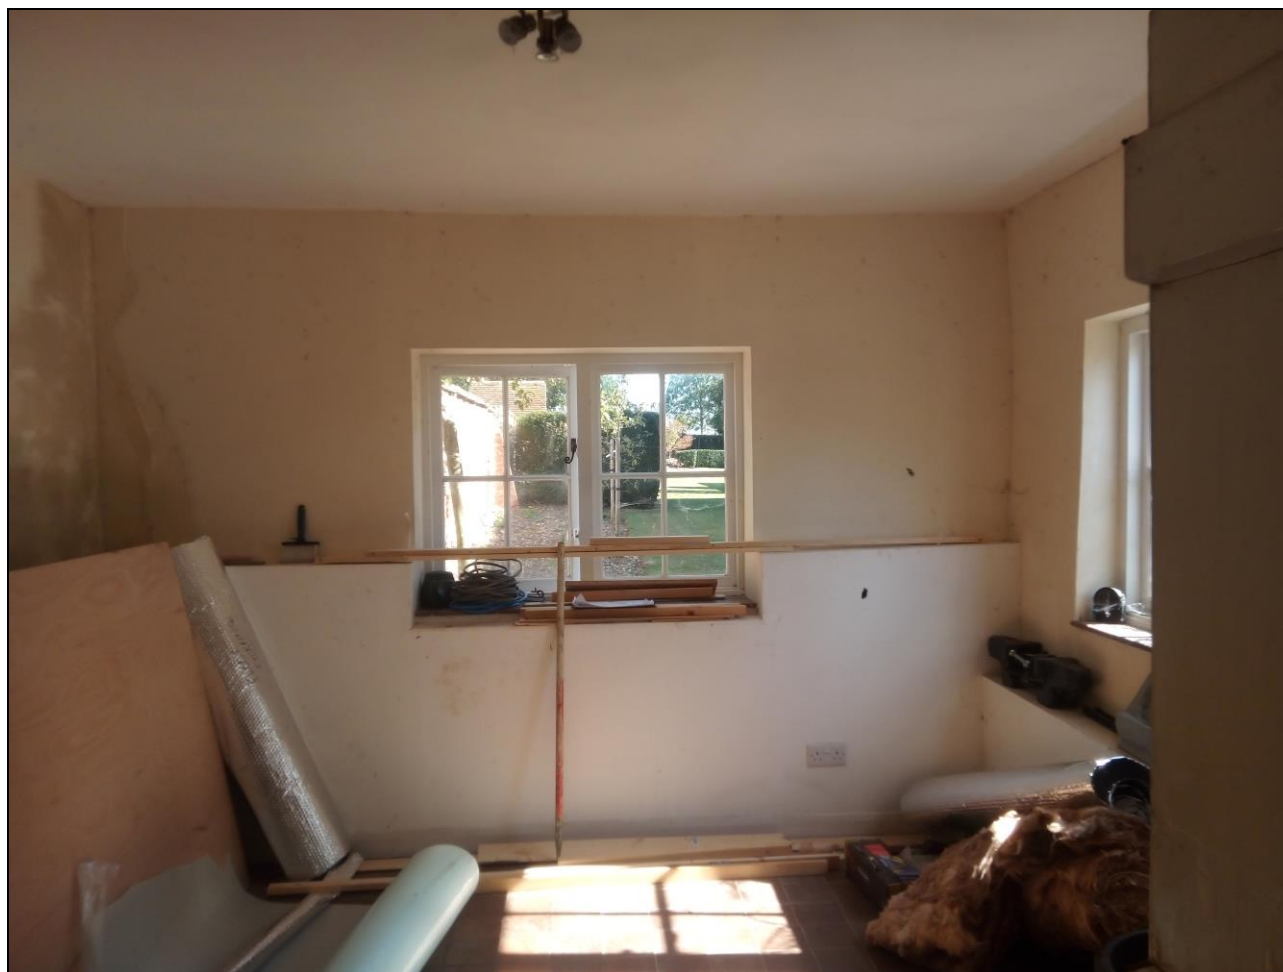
The interior of the 17th century brick coach house. The walls were largely covered by a thick layer of white plaster and were for this reason difficult to study in more detail. North east facing photo.
